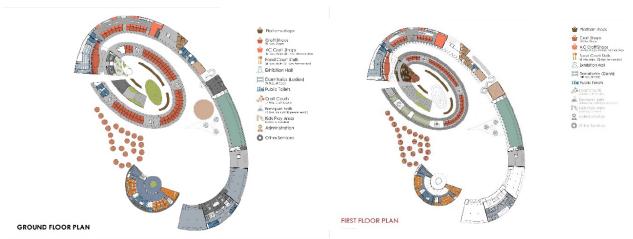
FLOOR PLAN OF AVADH SHILPGRAM (SOURCE: ARCHELLO.COM)
